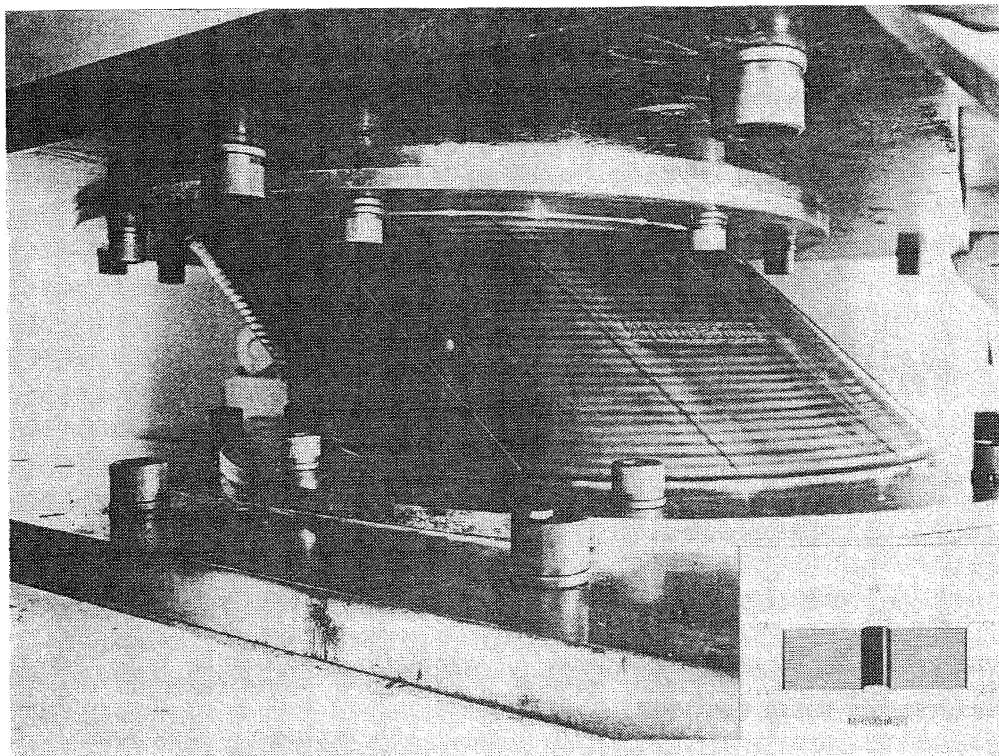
FULLY BONDED BRIDGESTONE BEARING UNDER TEST.
